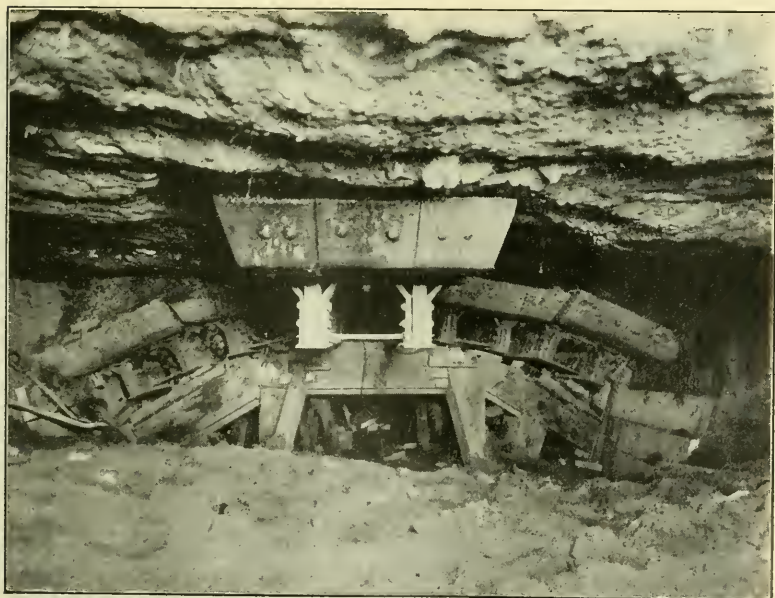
TUNNEL JILLS BREAKING INTO SPACE UNDER TRINITY VESTRY BUILDING.
